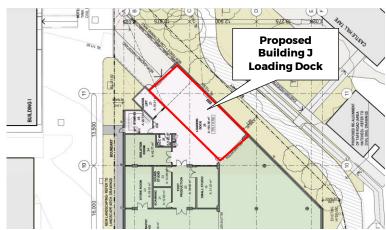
Building J Loading Dock location Source: Lahznimmo Architects
